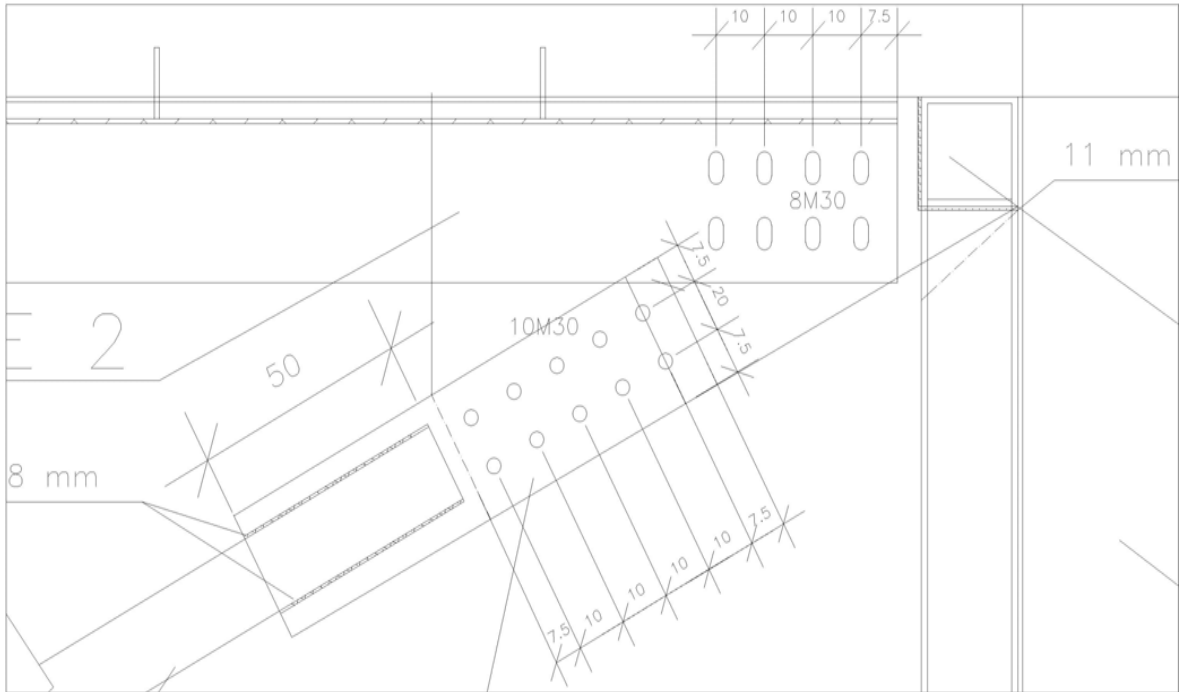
Enlarged view of the Connection Detail (Y-Z)
